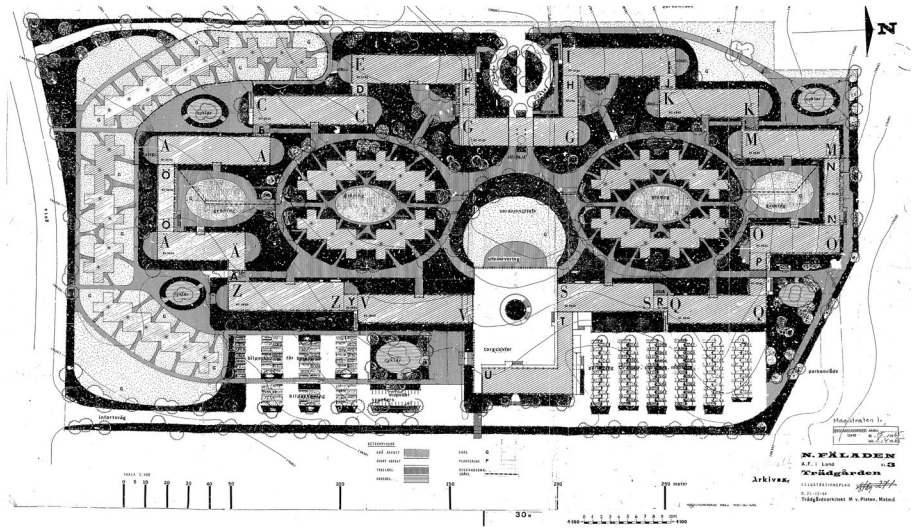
Plan of Delphi in Lund (1965–68) by Hans Westman. There are student corridors in the larger buildings, four-leaf clover houses on the yard and along the road, and a centre with a shop, restaurant and public bath
